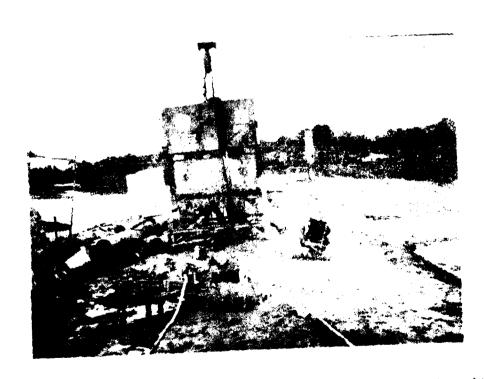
Vibratory hammer used for extracting stuck shoulder pipe (April 4, 1984)
